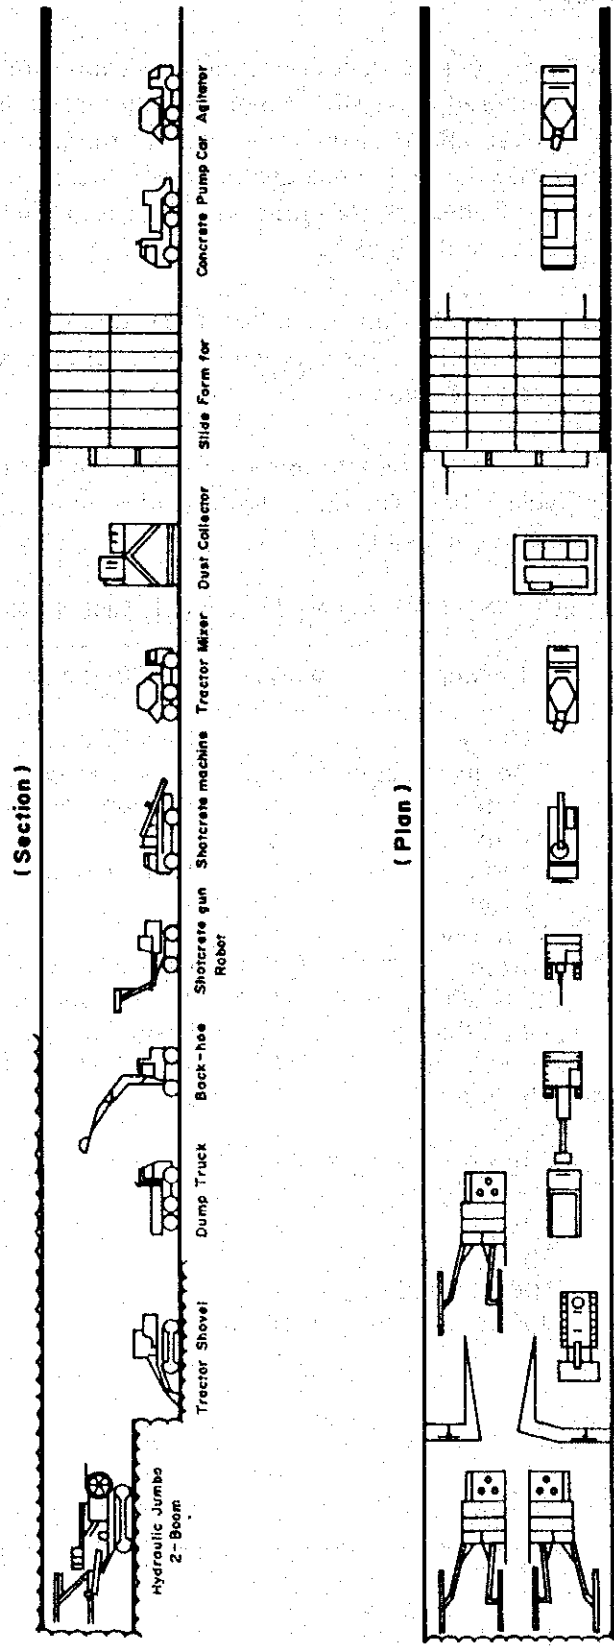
ARRANGEMENT OF TUNNELING MACHINE AND EQUIPMENT
